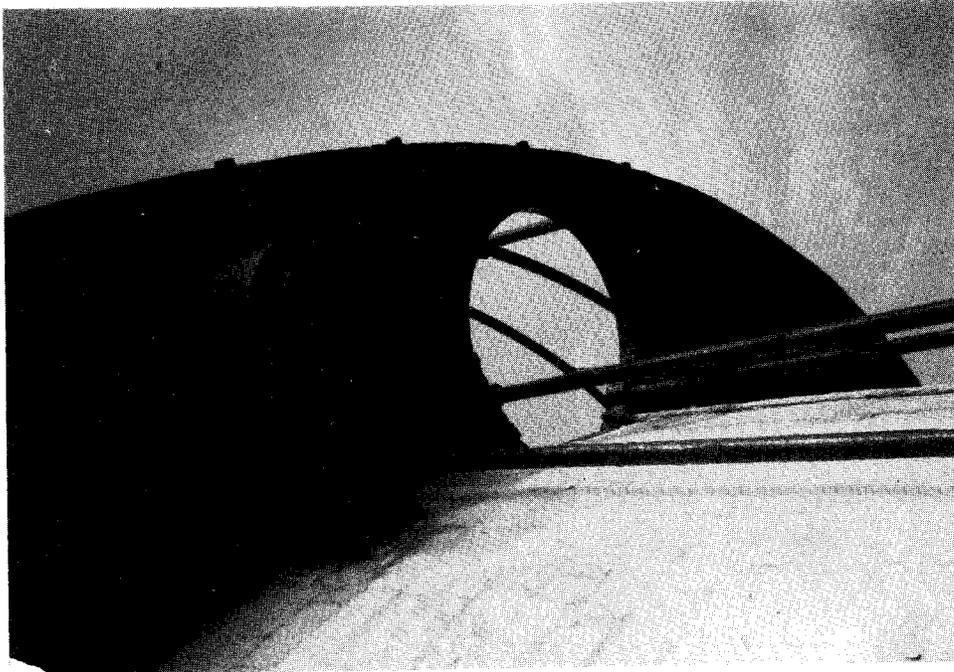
Tower at Watch Gallery: pipe support, tie rod, and underside of Lantern Gallery, showing ladder opening.
